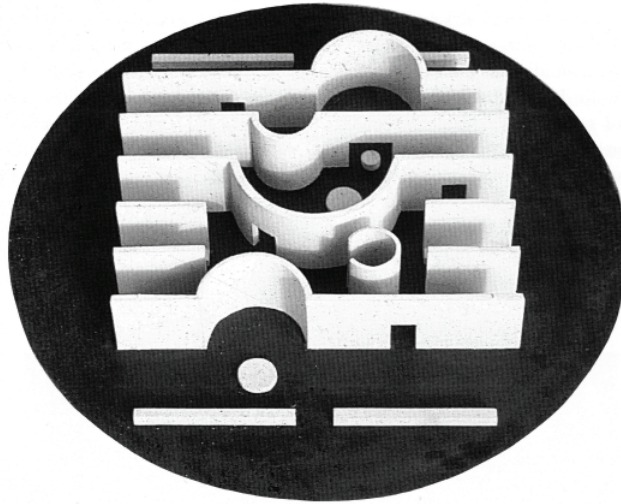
, 58. Axonometric drawing and plan of Aldo van Eyck's Sonsbeek Pavilion.
